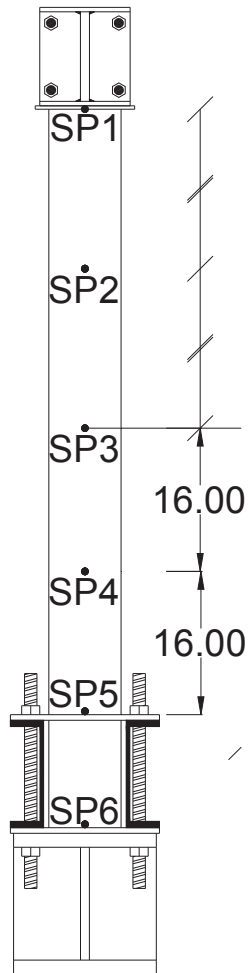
Typical String Pots Layout [Units Shown in inches, 1in=25.4mm]
